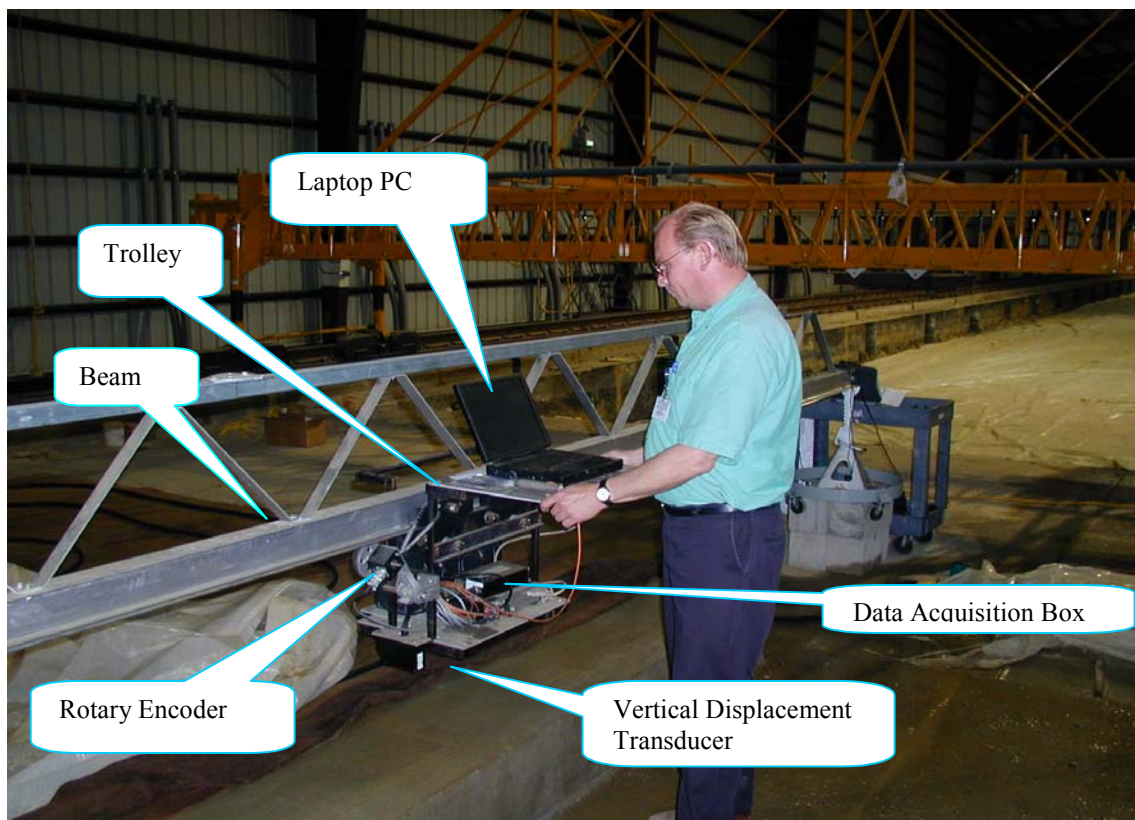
FAA pavement profiling equipment configured for measurements of test slab.
